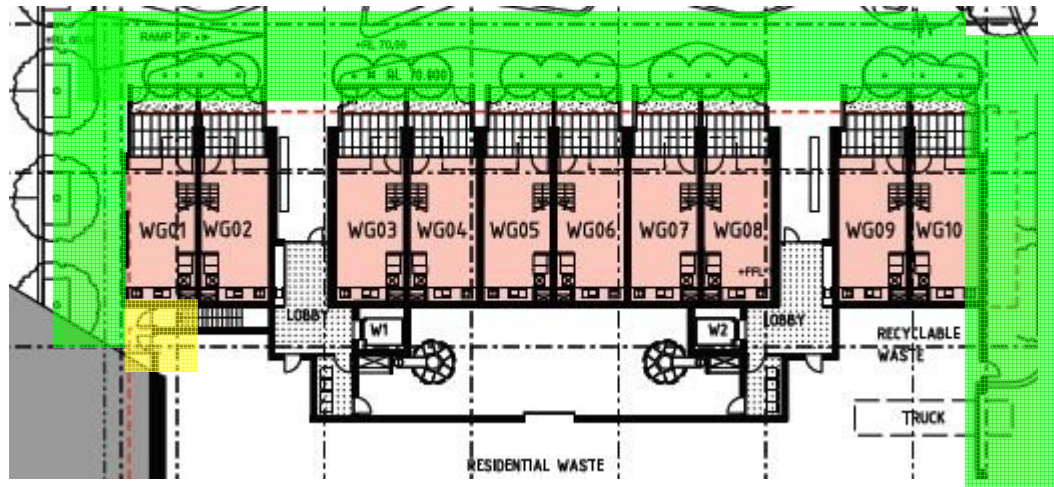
Schematic plan view of the proposed Building W with the recommended wind criteria overlaid on adjacent ground level areas.
